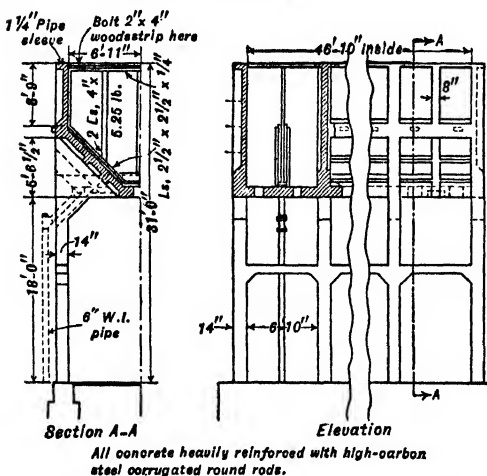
Reinforced-concrete tailing bin, St. JOSEPH LEAD CO.
